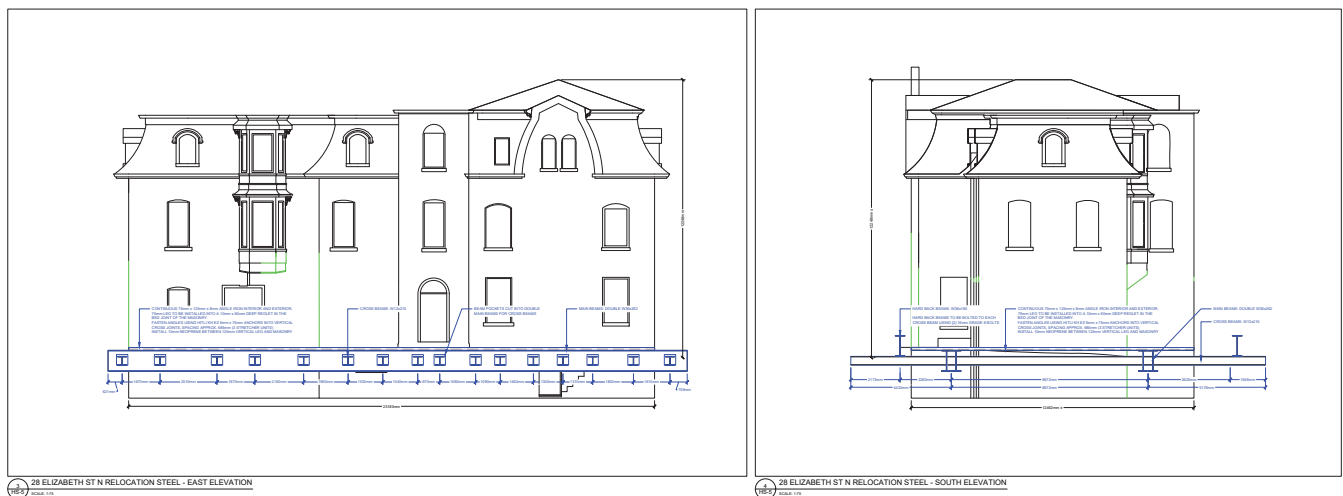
An excerpt from the relocation plan, showing the structural support below the first floor.
